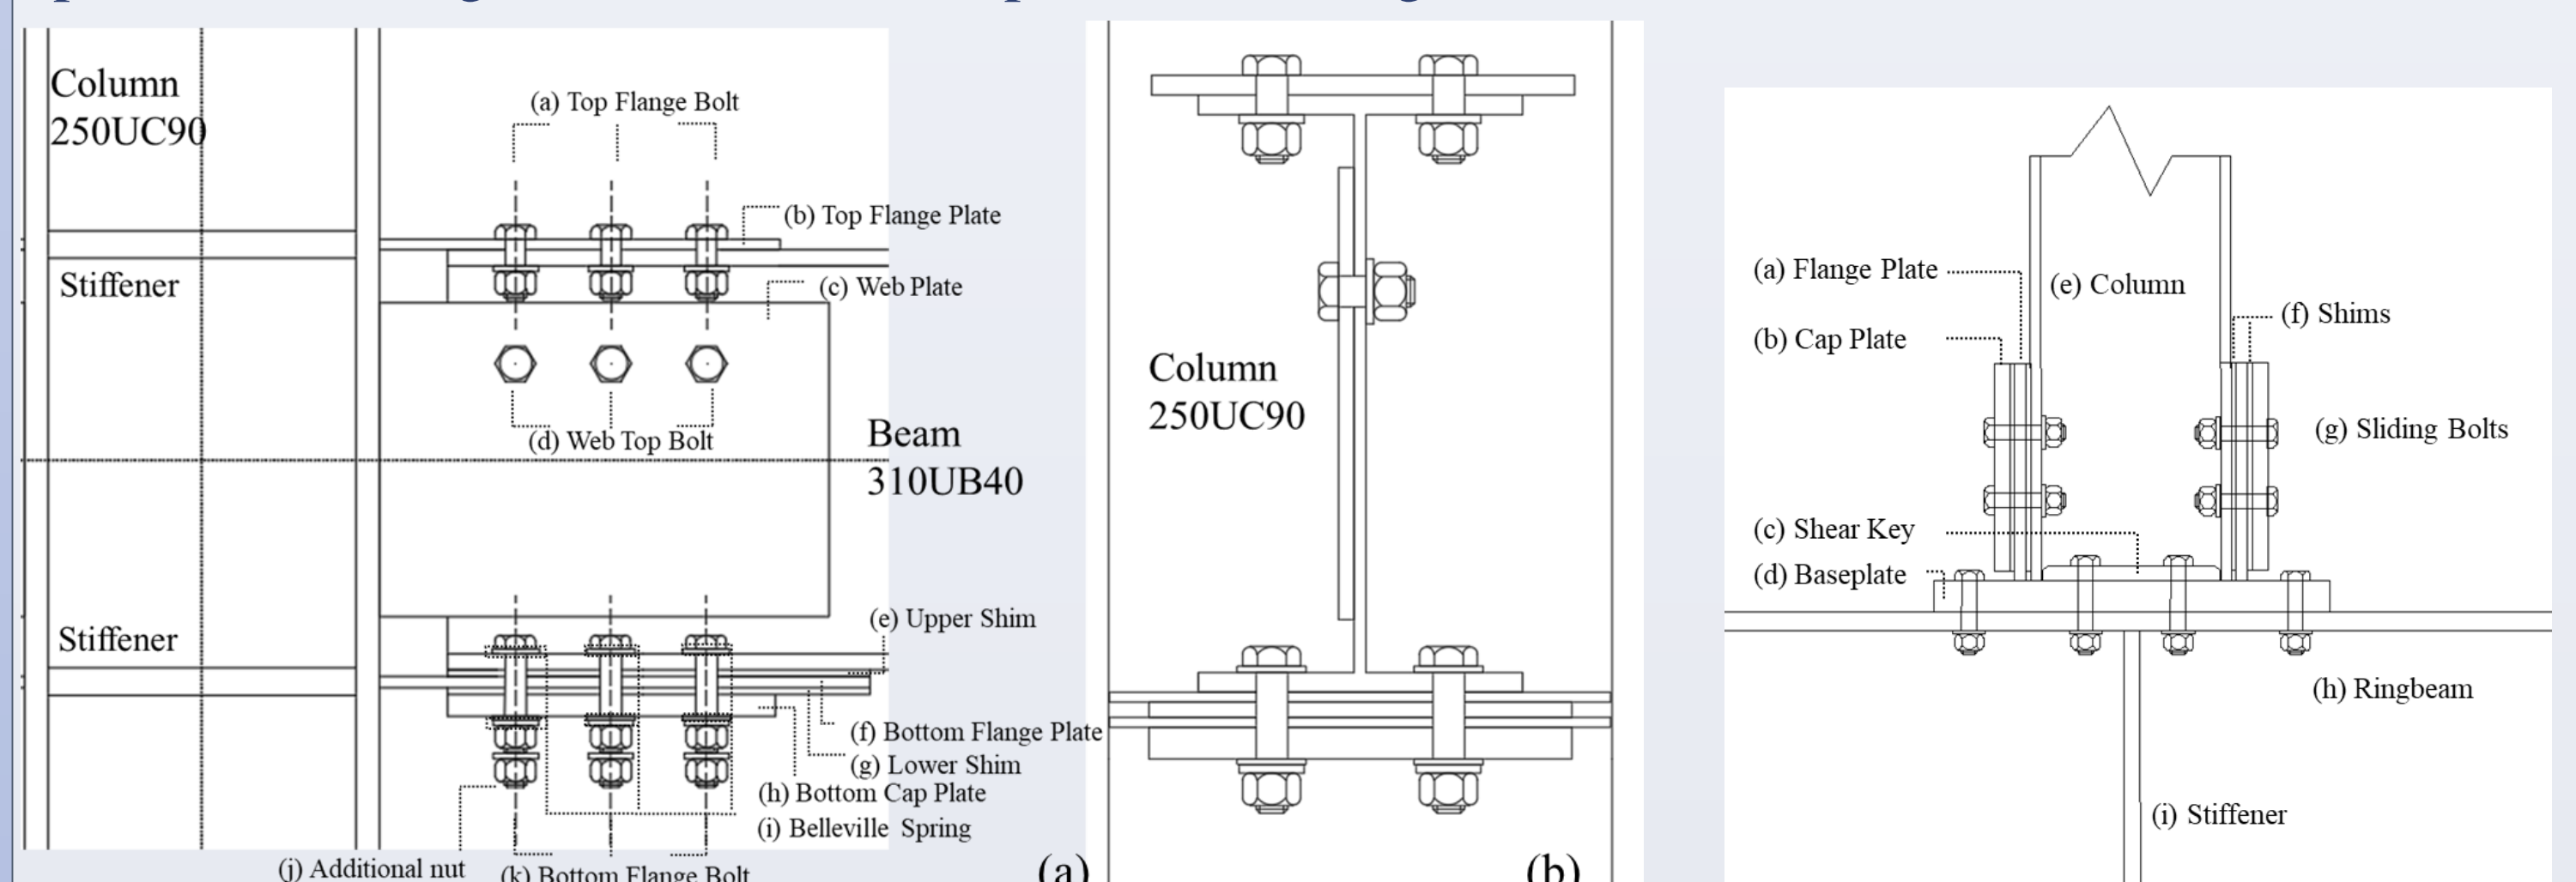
SHJAF Layout (a) Lateral View and (b) Beam Cross Section View
